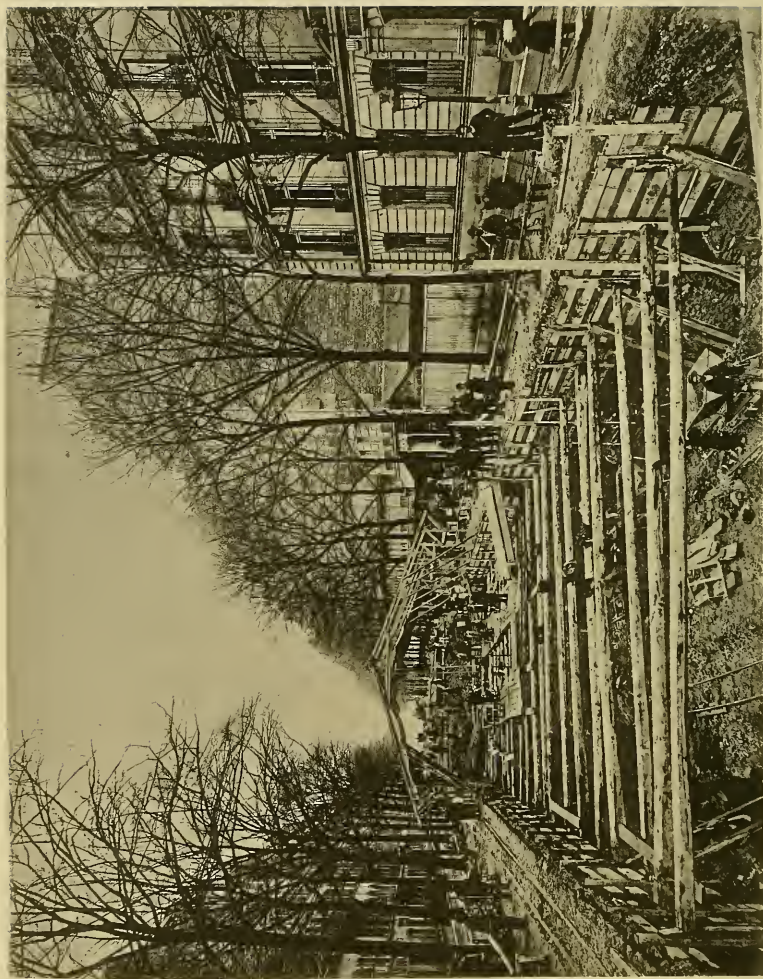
TRENCH FOR ARCH OF SUBWAY, BOULEVARD ST. MICHEL,
